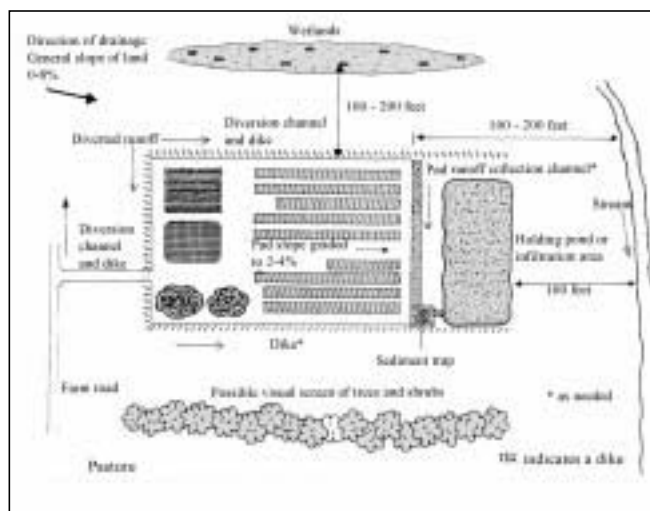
General site layout example 1, in feet. (3.3 Imperial feet = 1 metre)
